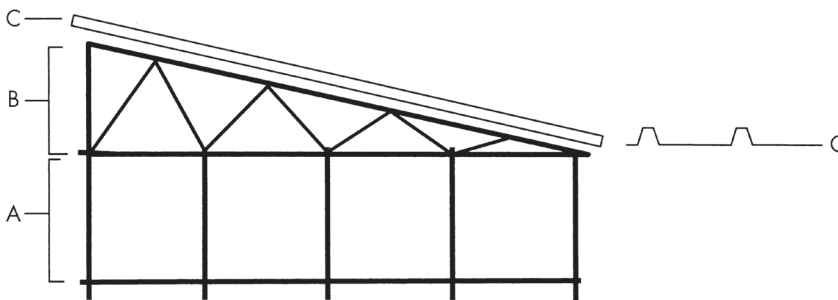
Section diagram of the basic configuration of a standard or traditional shelter made from scaffolding legs and a corrugated roof (see also fig. 6.3).
